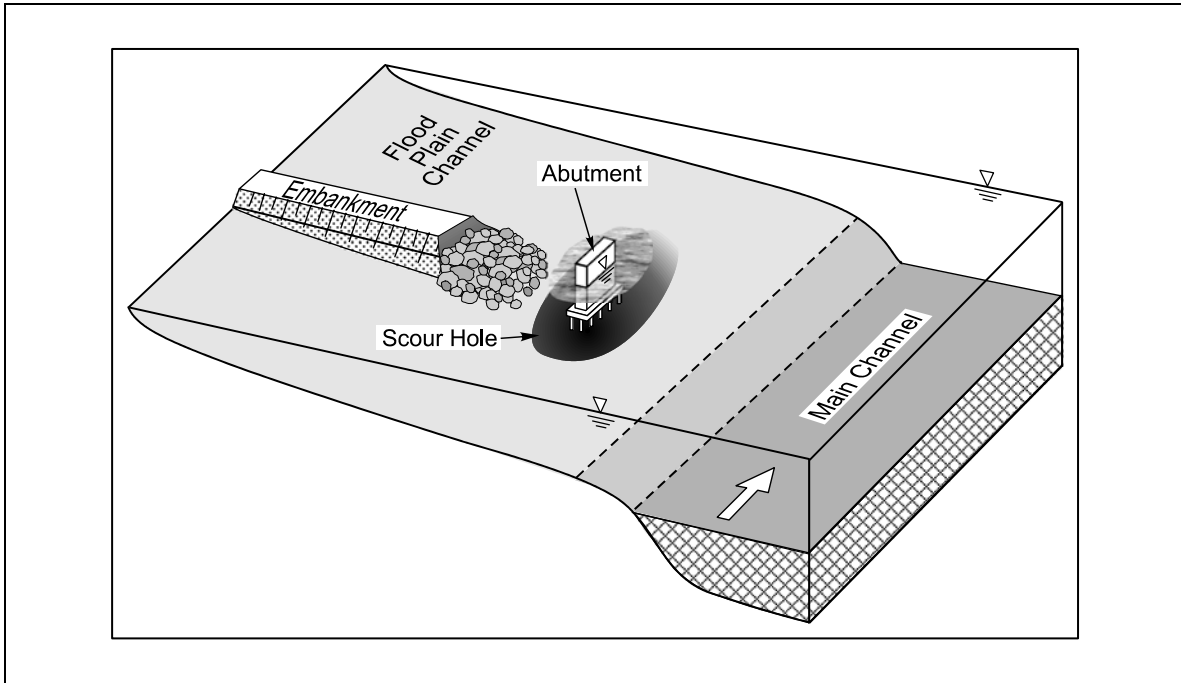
Washout of the approach embankment can fully expose the abutment foundation, such that further scour progresses as if the abutment were a form of pier
